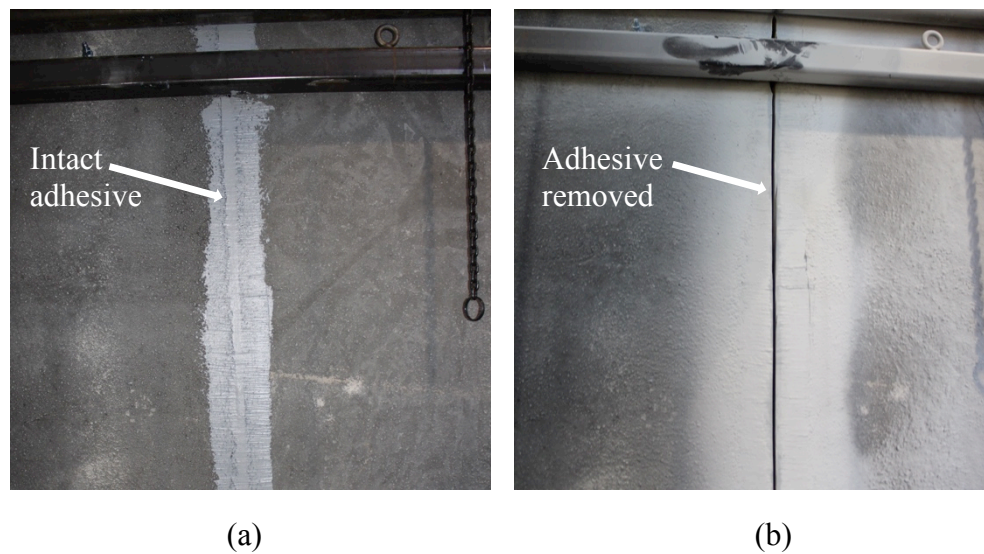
Epoxy-putty adhesive removal: (a) back side of Test #1 with intact adhesive; (b) back side of Test #2 with adhesive removed with grinder.
